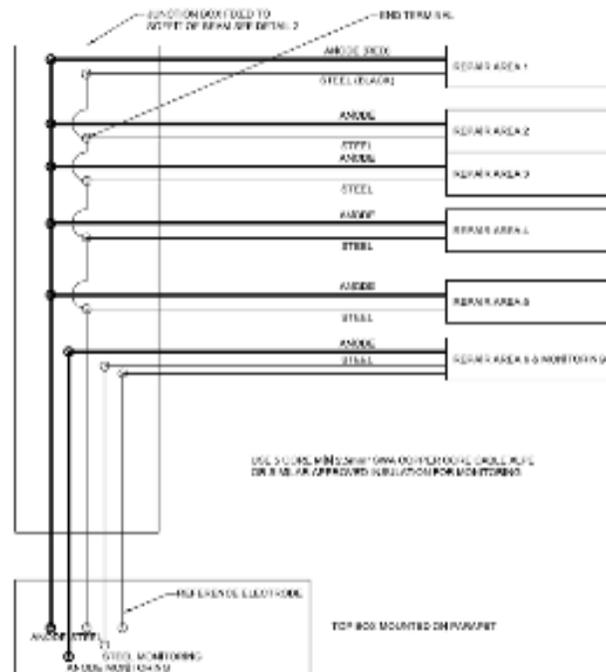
Schematic layout for the installation of the hybrid anode system in the pre-stressed concrete beams
